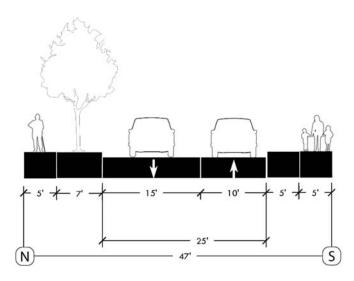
Street Cross-Section, central section typical (Olympic View Drive to SR 99)
